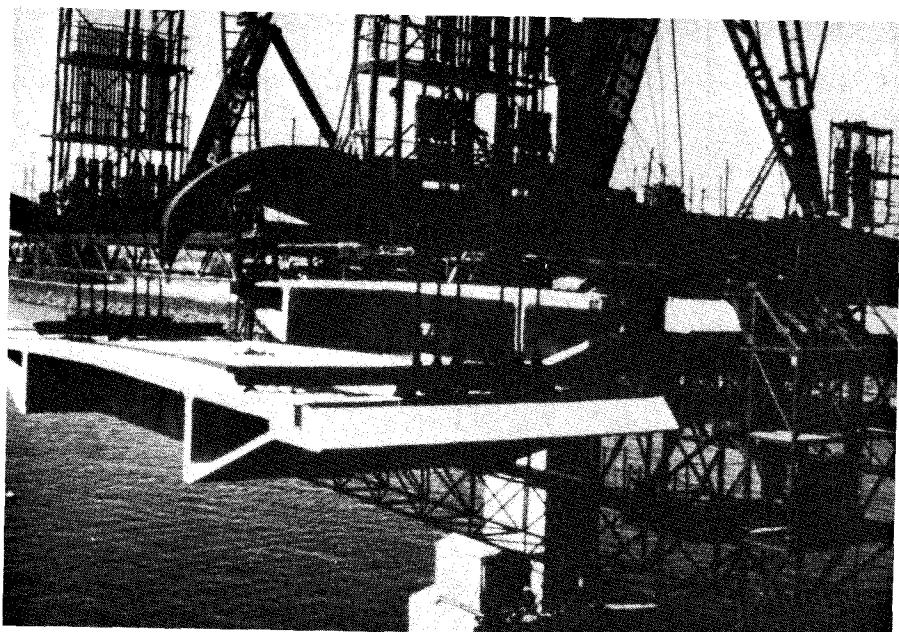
Precast segment erection of Pasco-Kennewick Bridge over Columbia River in the State of Washington. (Courtesy: Arvid Grant, Olympia, Washington.)
